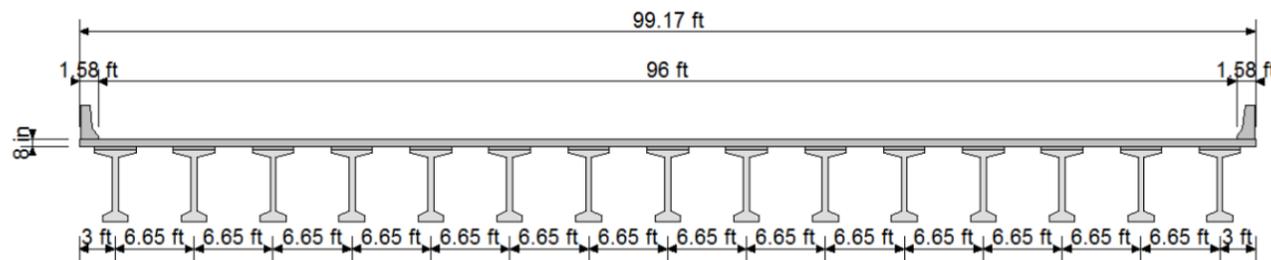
UPRR Overpass Bridges - NB Bridge Typical Section
